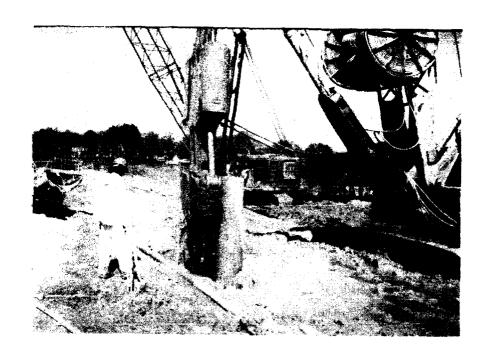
Vibratory hammer extracting shoulder pipe from Panel 47 (April 5, 1984)
